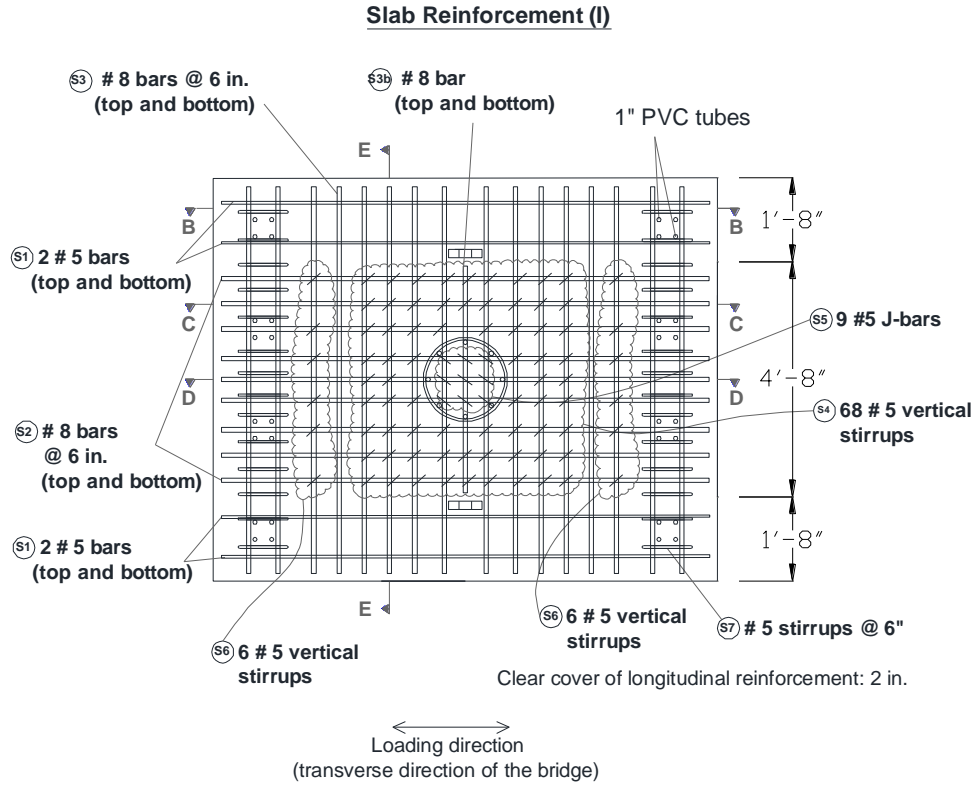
Plan view of slab reinforcement for Specimen #1
